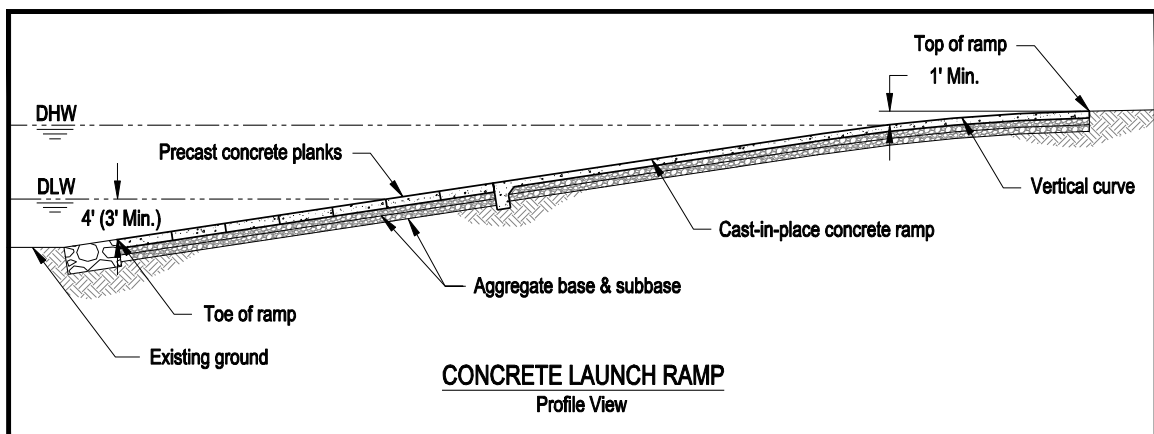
Design water levels as they relate to top and toe elevations of launch ramp
